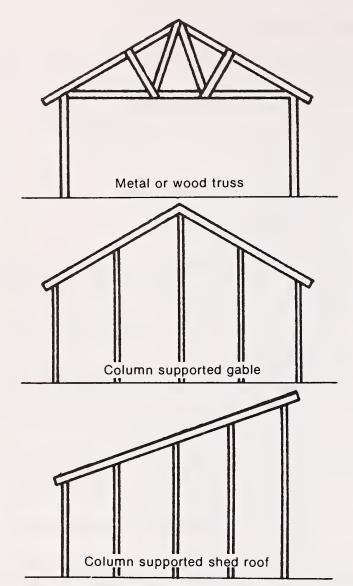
Freestanding column supported or truss frames (Ekblad 1973).
